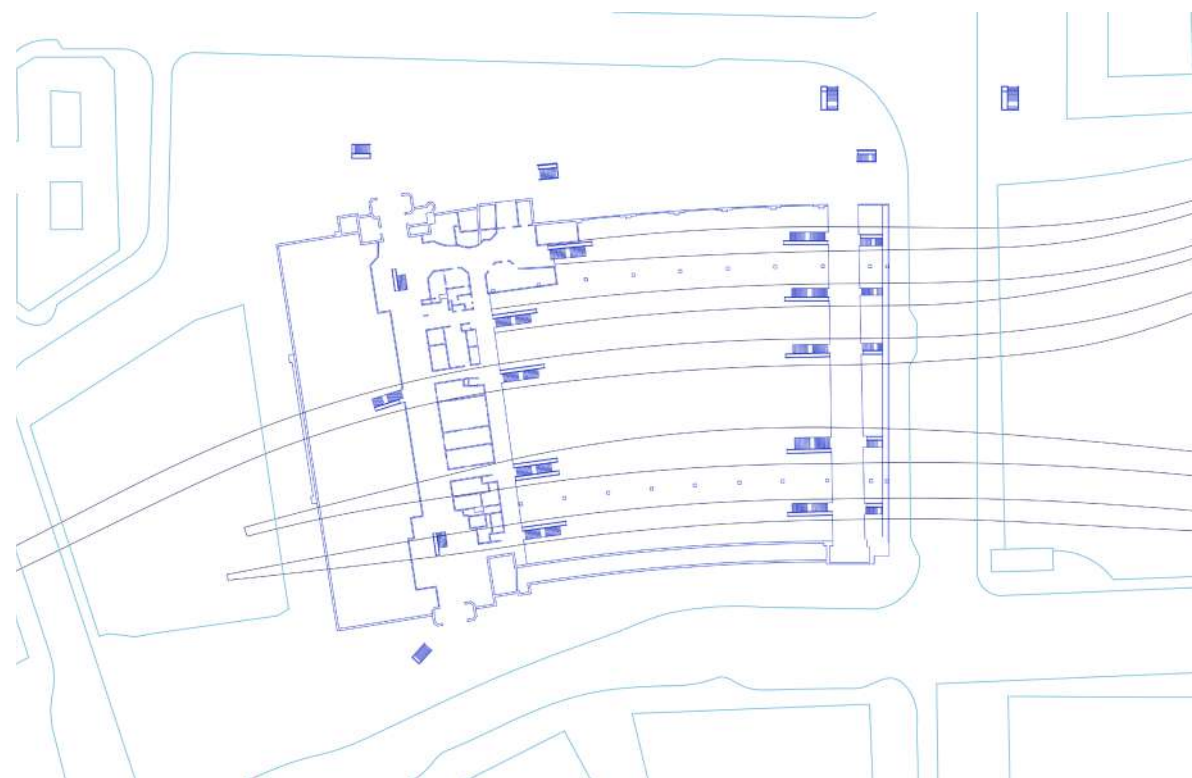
Schematic plan of Hamburg Hauptbahnhof
